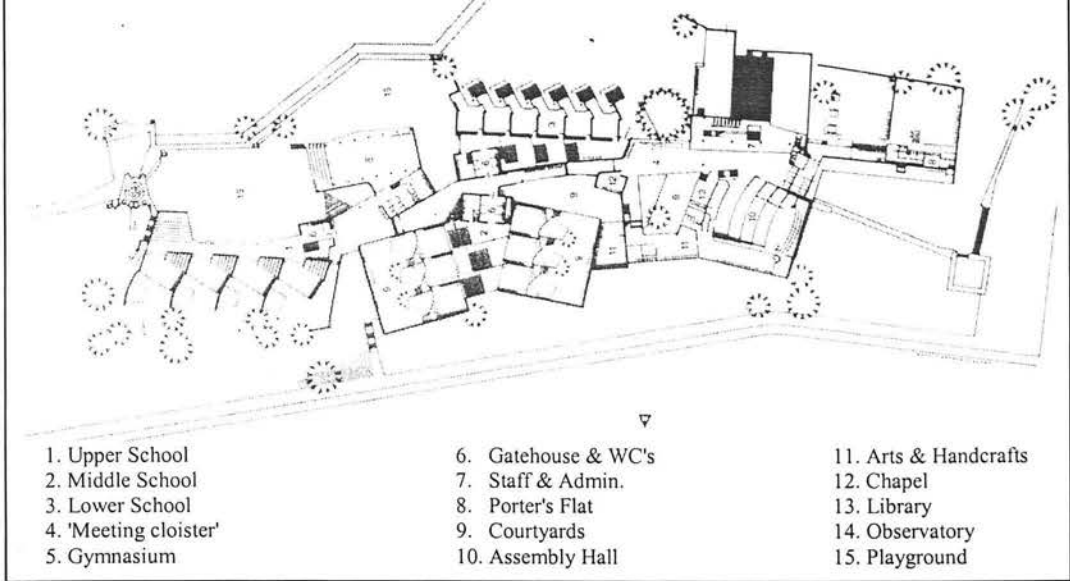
Ground floor plan of Hans Scharoun's project for a primary school in Darmstadt - 1951 (Dudek, 2000).
